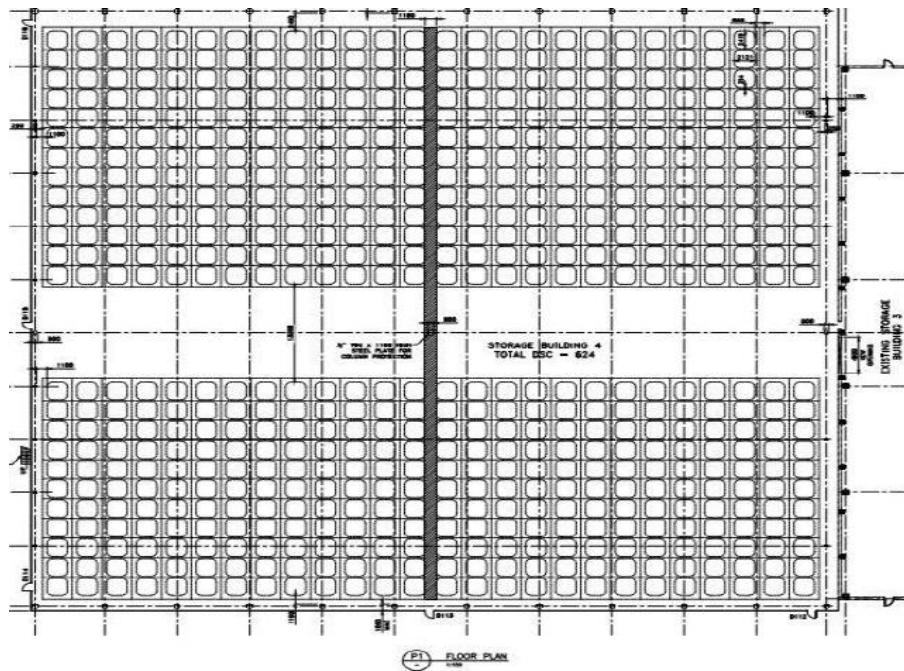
Layout of DSC Storage Building 4 (Phase II)
